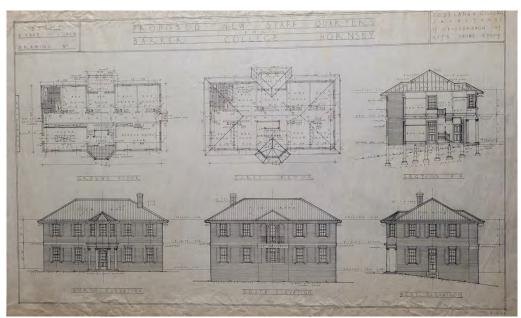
Plan for 'Proposed New Staff Quarters for Barker College Hornsby', undated, prepared by Joseland & Gilling, architects. (Source: Barker College Archives, Plan M0007B).
